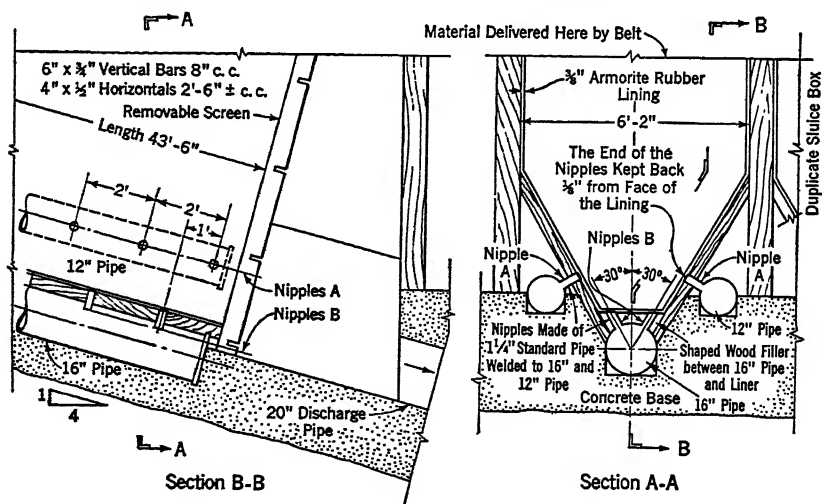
Sluice box at Winsor Dam, Massachusetts.
